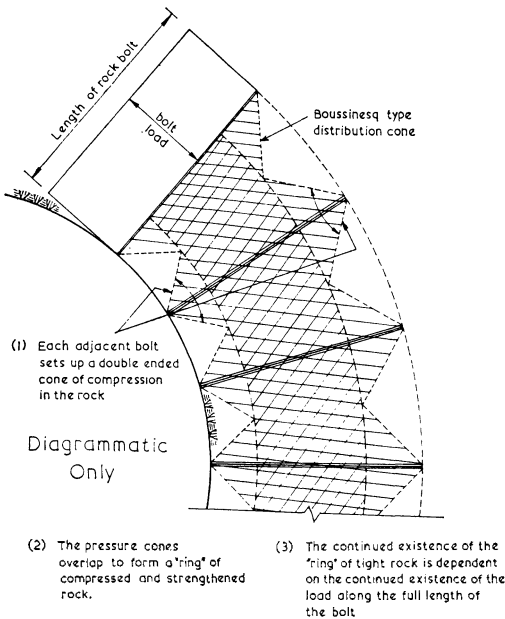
The action of rock bolts on the rock around an excavation (Pender et al 1963).
